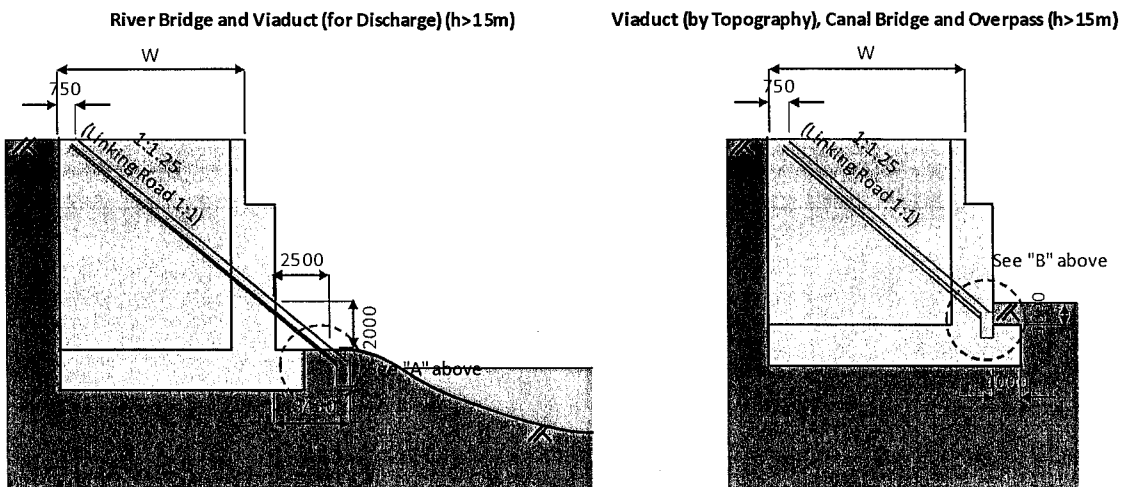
Requirements for Embankment Slope and Embedding of Abutment
